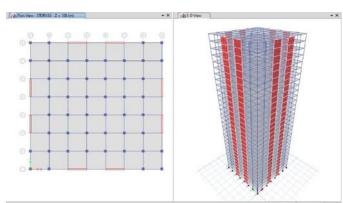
ETABS plan and 3D view of RCC and composite Shear wall structure with Coupling
